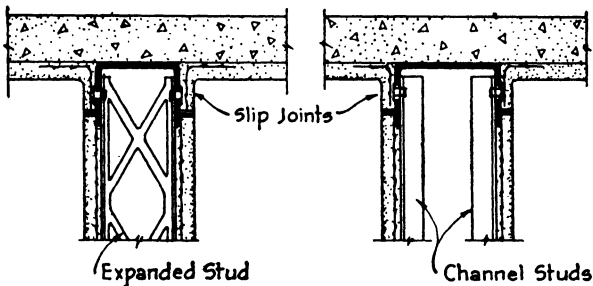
Providing Movement for Steel Stud, Lath and Plaster Partitions at Ceiling Line.
